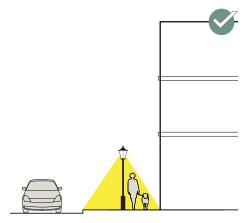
Use a small-scale fixture with down-lighting or light bollards to illuminate a pedestrian walkway.
